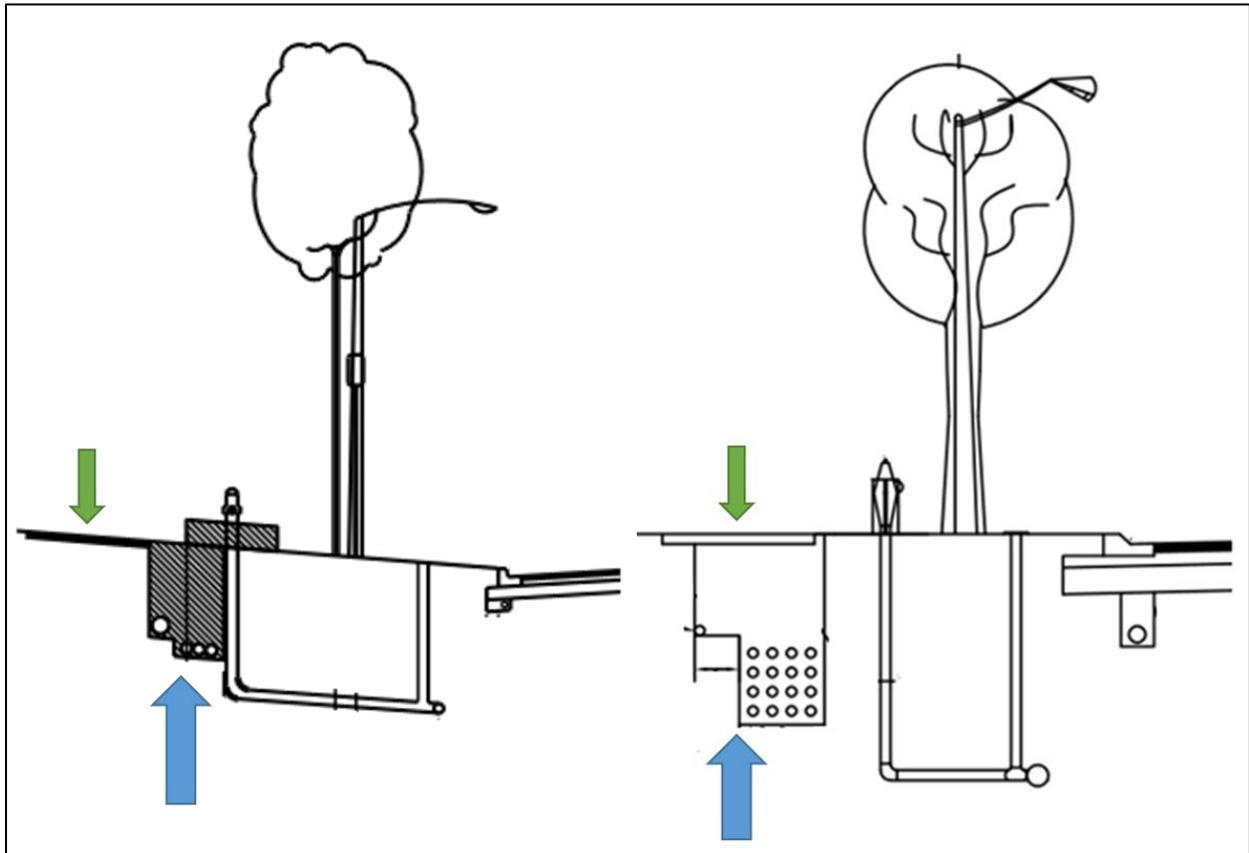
Selected details of standard local road cross-sections in Brampton (left) and Innisfil (right) (not to scale). Note the position of the joint utility trench (blue arrow) relative to the sidewalk (green arrow). Positioning the joint utility trench directly or even partly below the sidewalk (as shown), or between the property line and sidewalk, can increase available soil volume and minimize adverse impacts upon trees during utility installation or maintenance.
